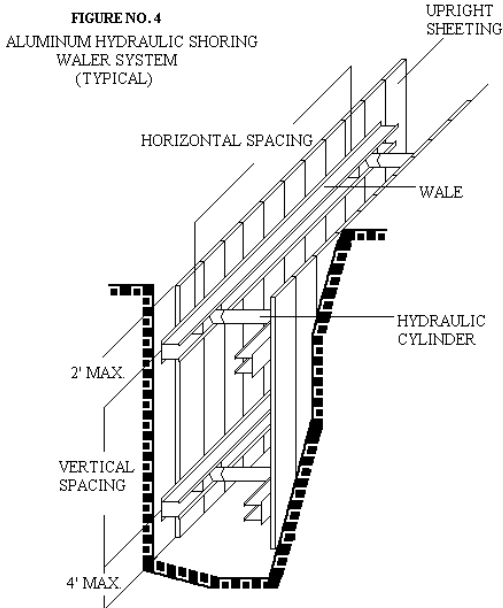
Aluminum hydraulic shoring - Waler System (typical)
